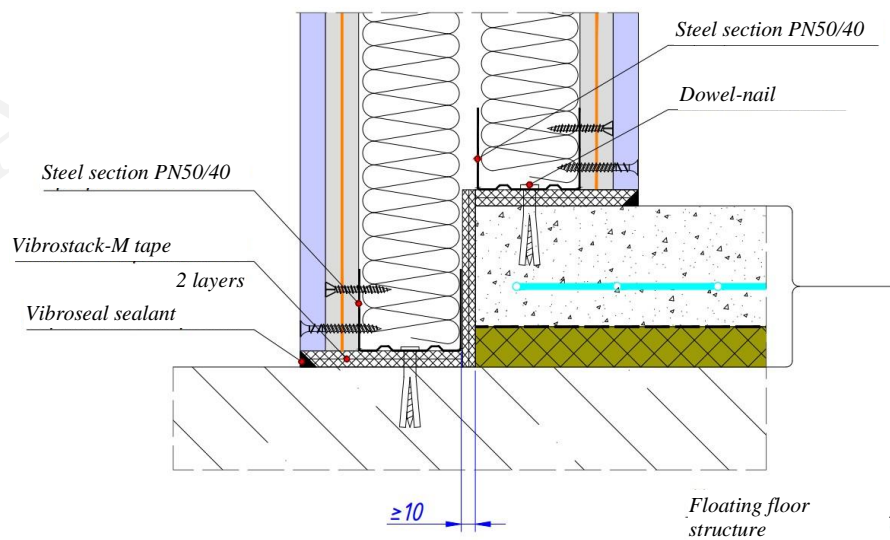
Connection of double-frame soundproofing partition to floating floor structure on one side of the partition.
